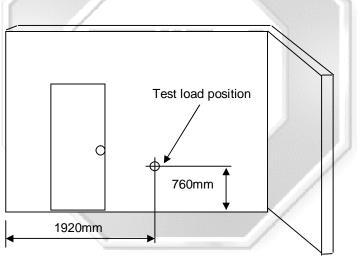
Locations of applied load for lightweight anchorage Pull-out test
